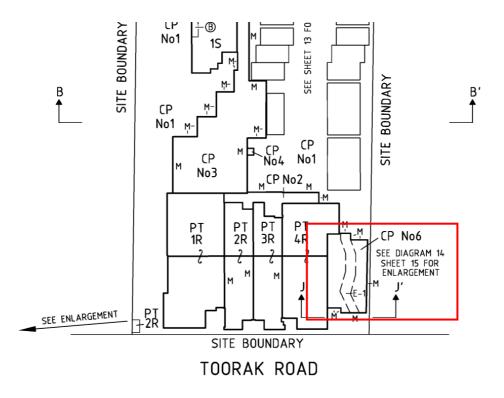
The ground floor of the subdivision plan which shows an easement.
